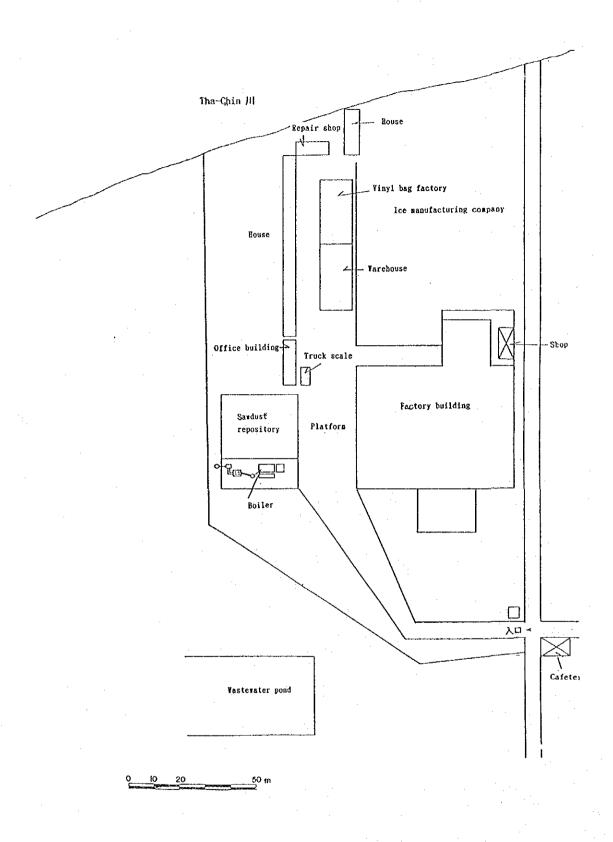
Site Plan of the Factory (Fish Meal Plant A)
